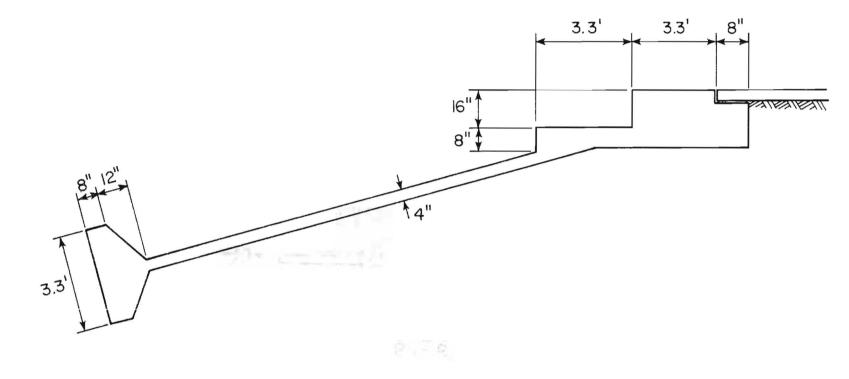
PRETENSIONING ABUTMENT FOR HIGHWAY PAVEMENT AT CESENA, ITALY
